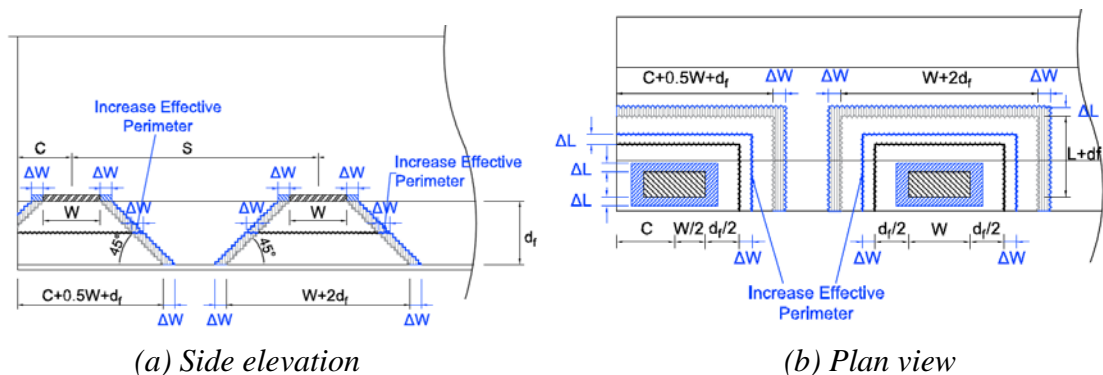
Solution for Punching Shear Failure by Increasing Bearing Pad Size.
